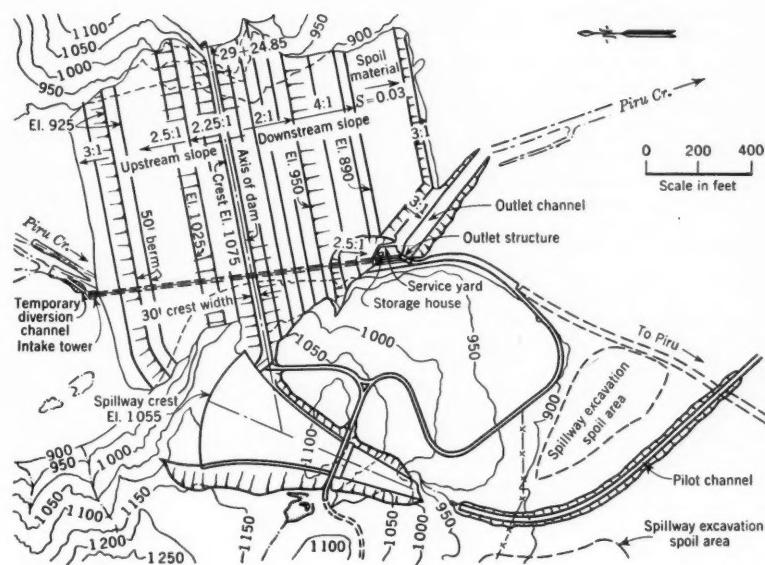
Santa Felicia Dam and appurtenant works will contain about 4,000,000 cu yd of fill and 30,000 cu yd of concrete. Spillway is ungated ogee crest located on bench at west end of dam, and will discharge into funnel-shaped chute.
